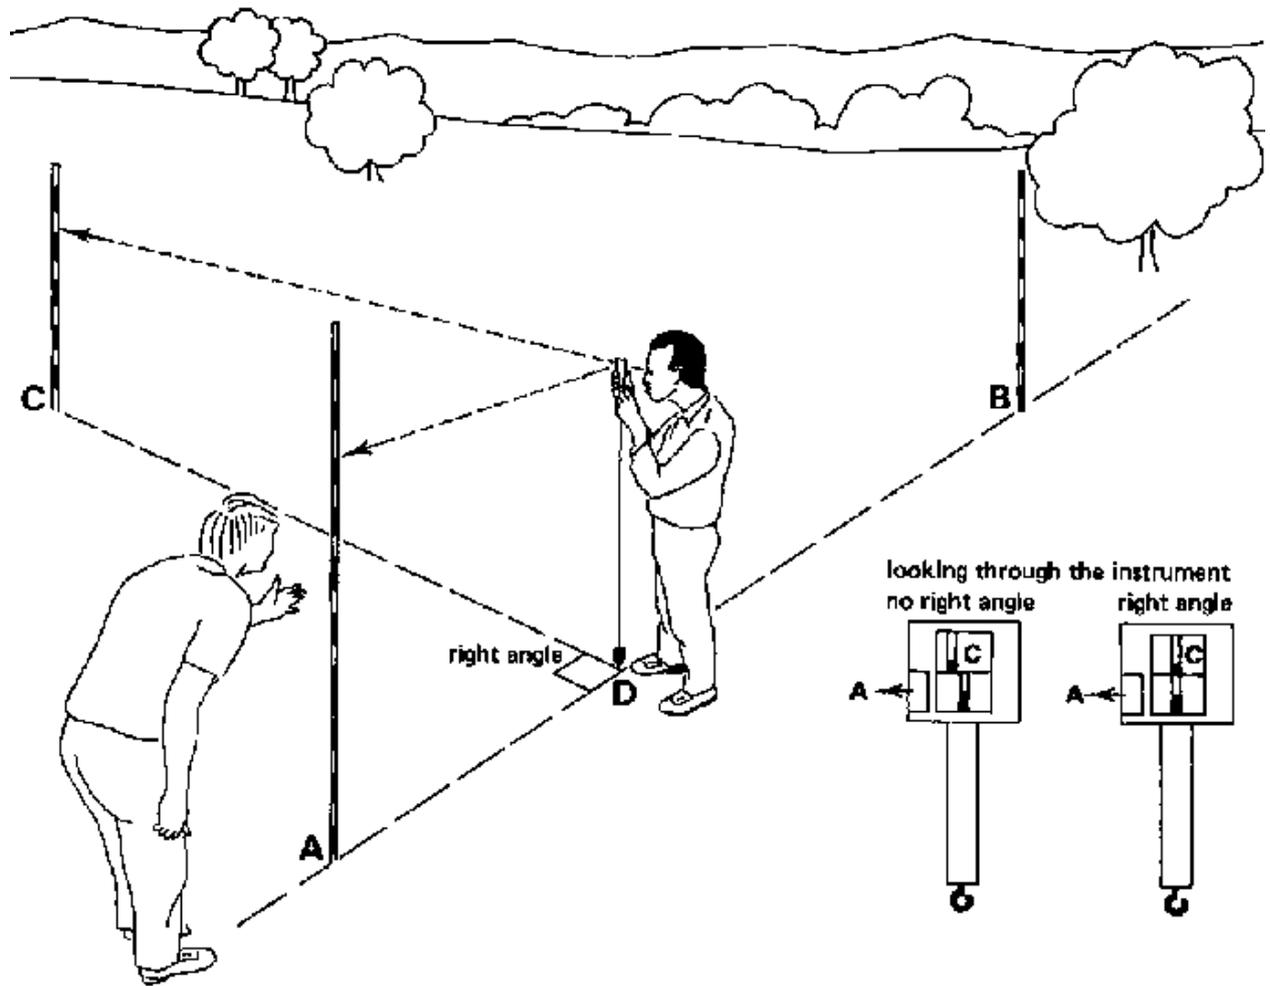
Setting out a perpendicular line, Step 1](#)
